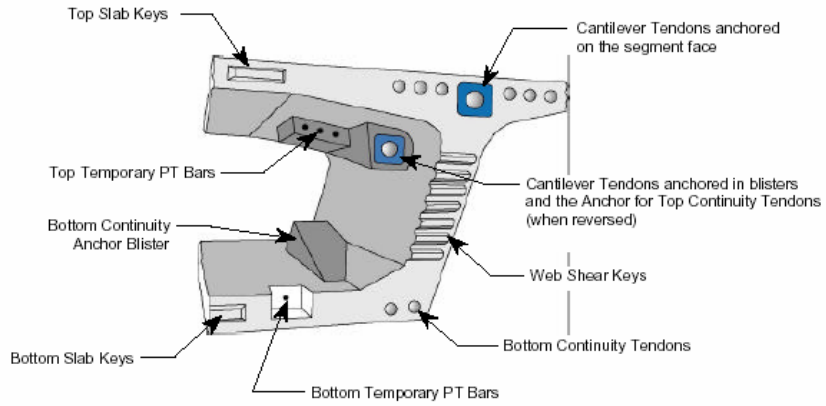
Typical Balanced Cantilever Segment ^{2.10}
